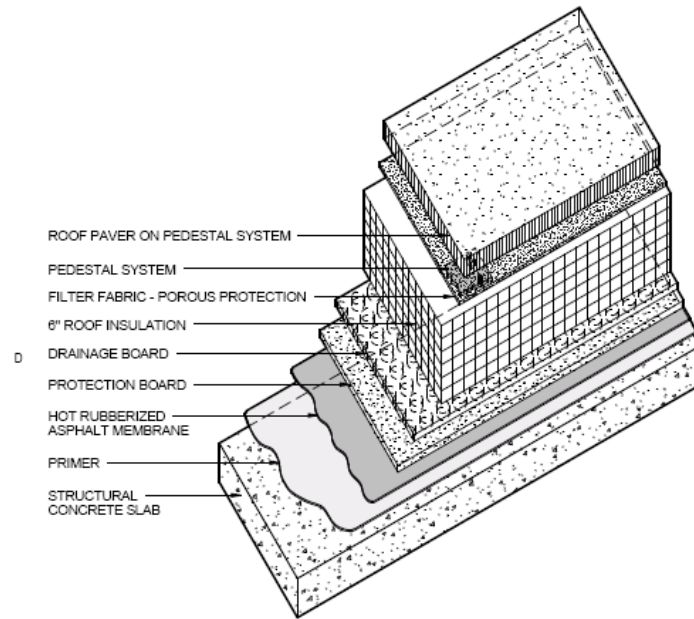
Roof Assembly Breakdown (image provided by HDR, Inc.)
